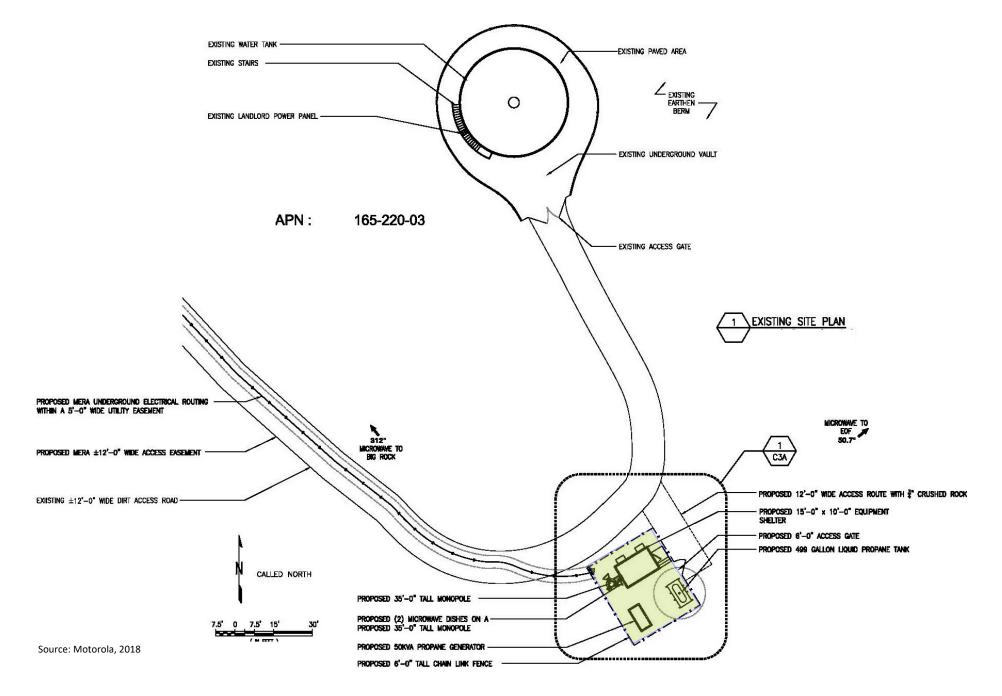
Site 22- Skyview Terrace Water Tank Overall Site Plan
